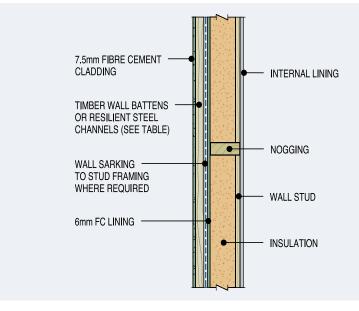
7.5 mm Fibre Cement Board over 6 mm Fibre Cement cladding. Vertical section through wall
